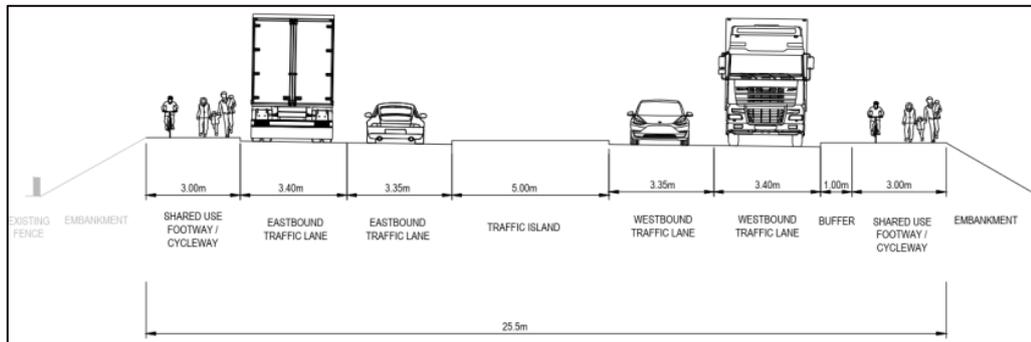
A4130 Widening typical cross section, west of Backhill Lane Tunnel
